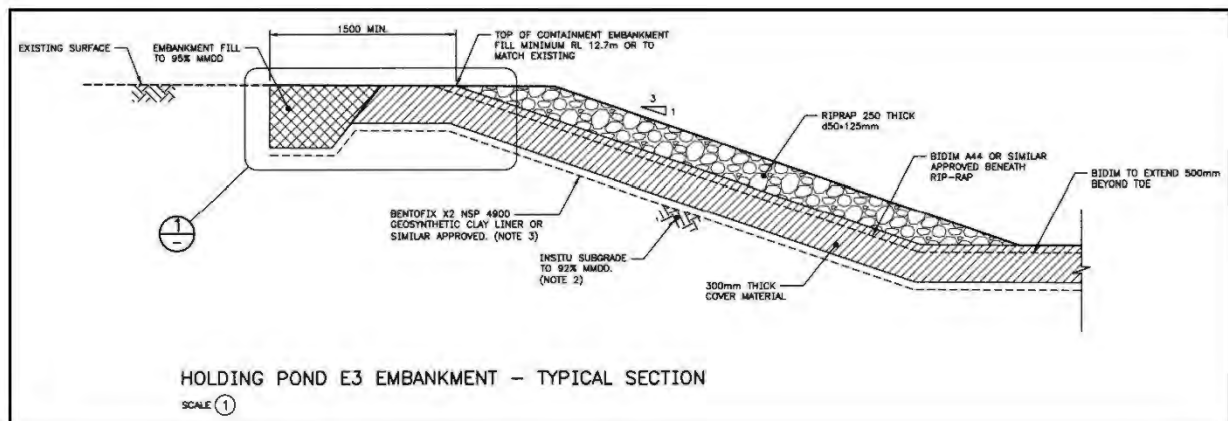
Storage pond approved liner configuration construction plan (adapted from Bowman and Associated 2016, page 25).
